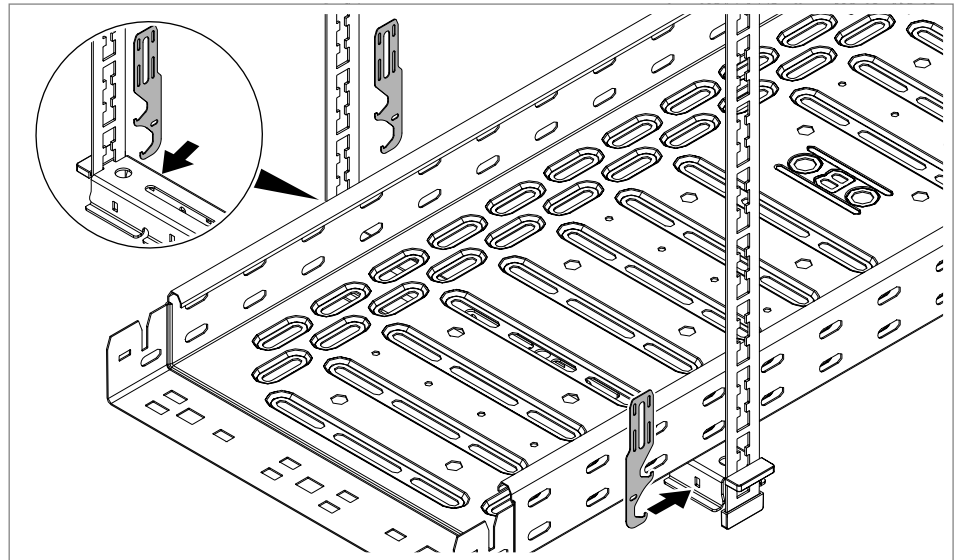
Hook quick connectors into support rail, tray height 60 mm
